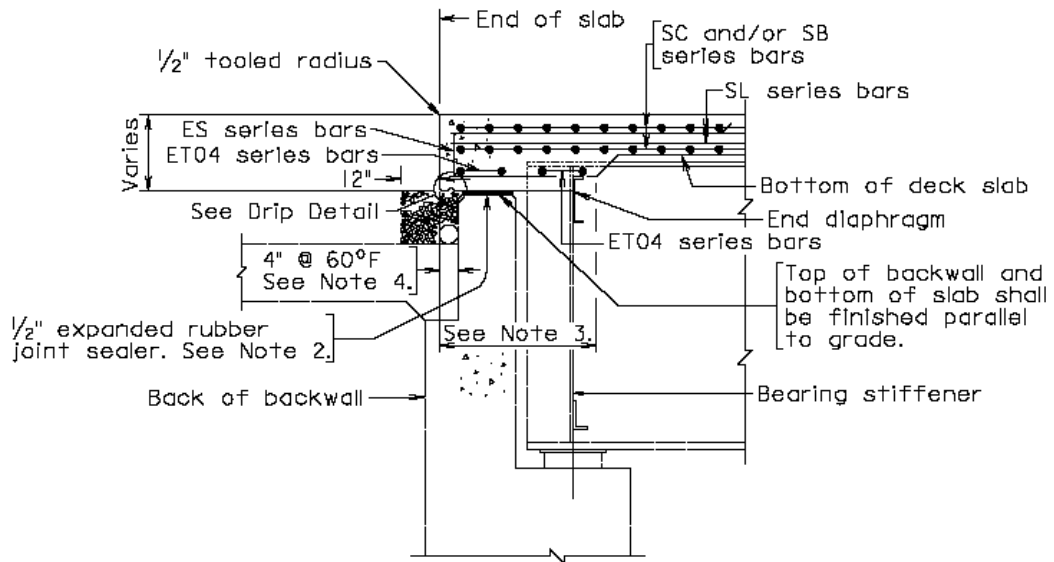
Example deck extension detail (courtesy of Virginia DOT)
